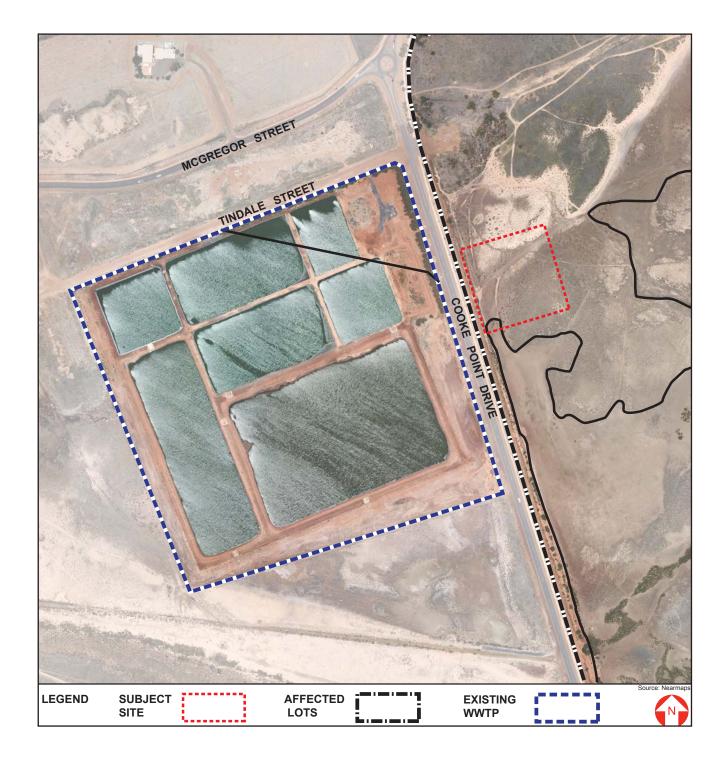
AERIAL PLAN - PUMPING STATION SITE
